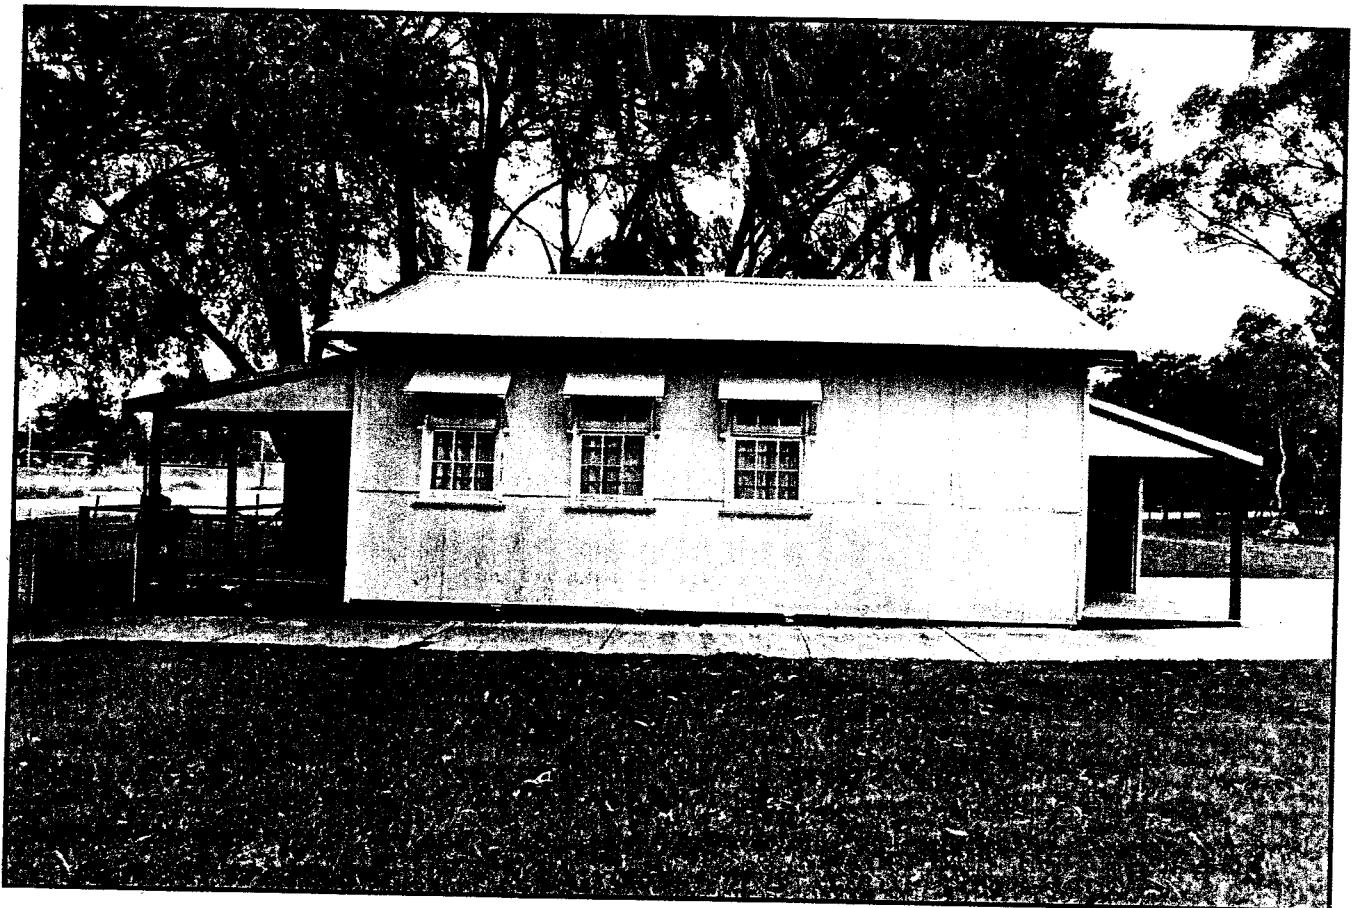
General view of side of Play Group building; note straight alignment of ridge, gutter and window sills
